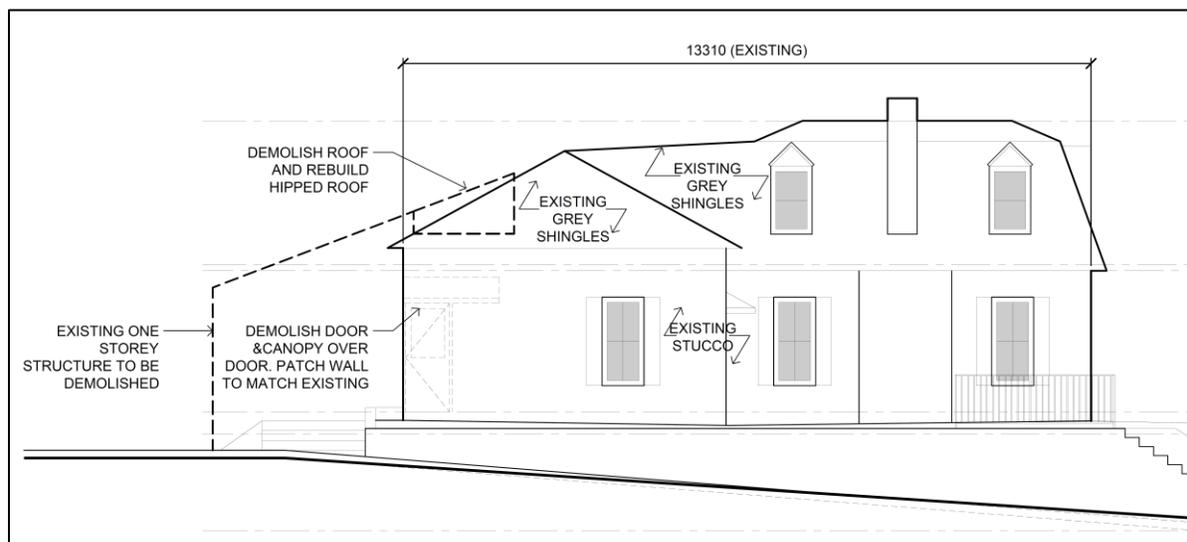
Elevation drawing of the east elevation showing the removal of the Taylor-Froebel House's sunroom. (Weiss Architecture and Urbanism Ltd.)
